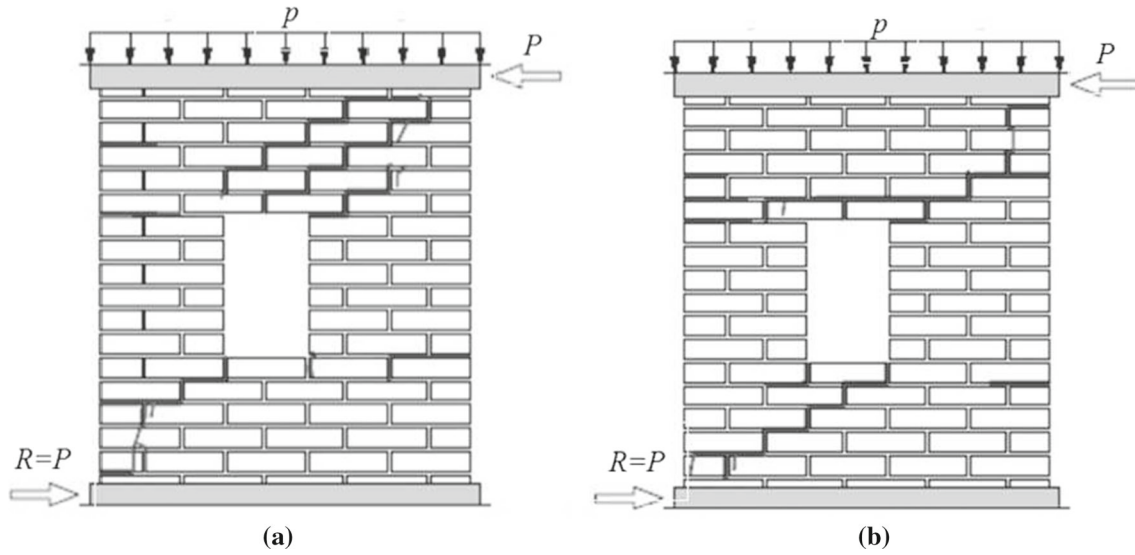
Crack patterns of the walls tested by Raijmakers and Vermeltfoort [49]
